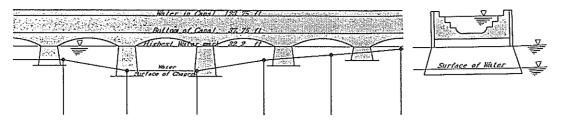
Proposed Viaduct in a Panama Canal Plan by the U.S. Navy (1870~75)
